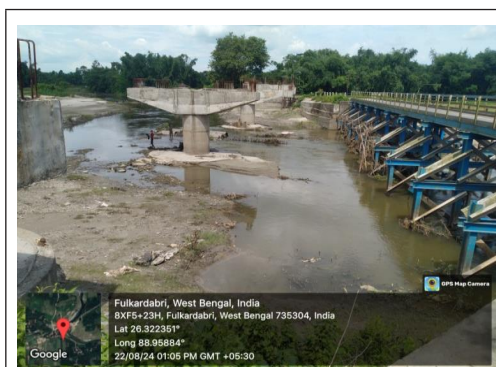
Bridge at chainage 1.00 km of Bagdogra-Fulkabari over River Saniajan under Teesta Bridge Construction Division in the district of Coochbehar
